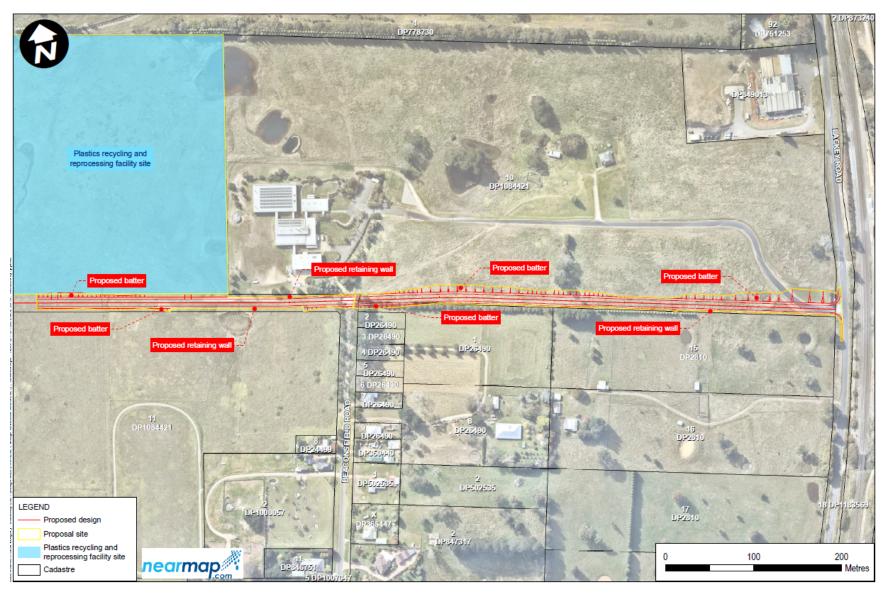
Option 2b: New access road – Connecting Lackey Road with the plastics recycling and reprocessing facility site (alternative alignment)
